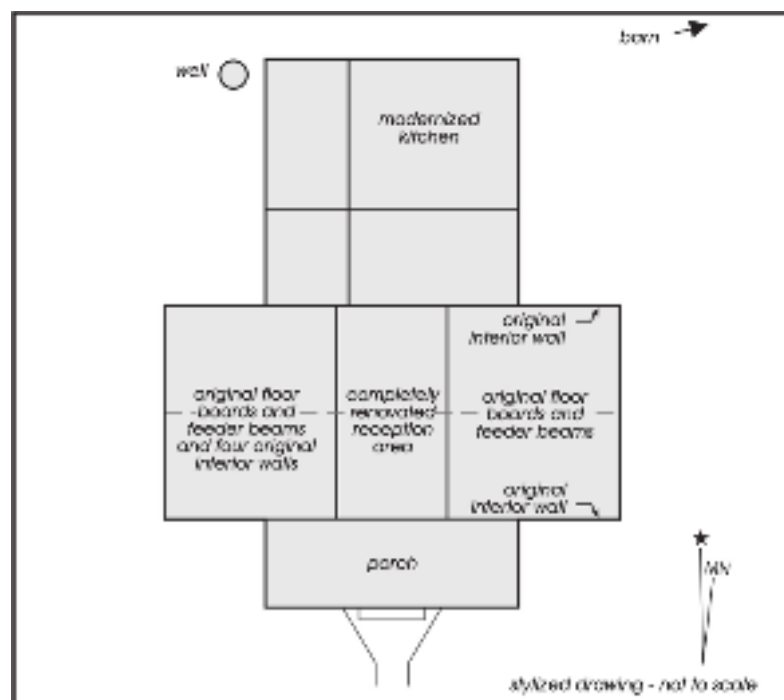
Floor plan of structure at 1408 Chestnut Street.
